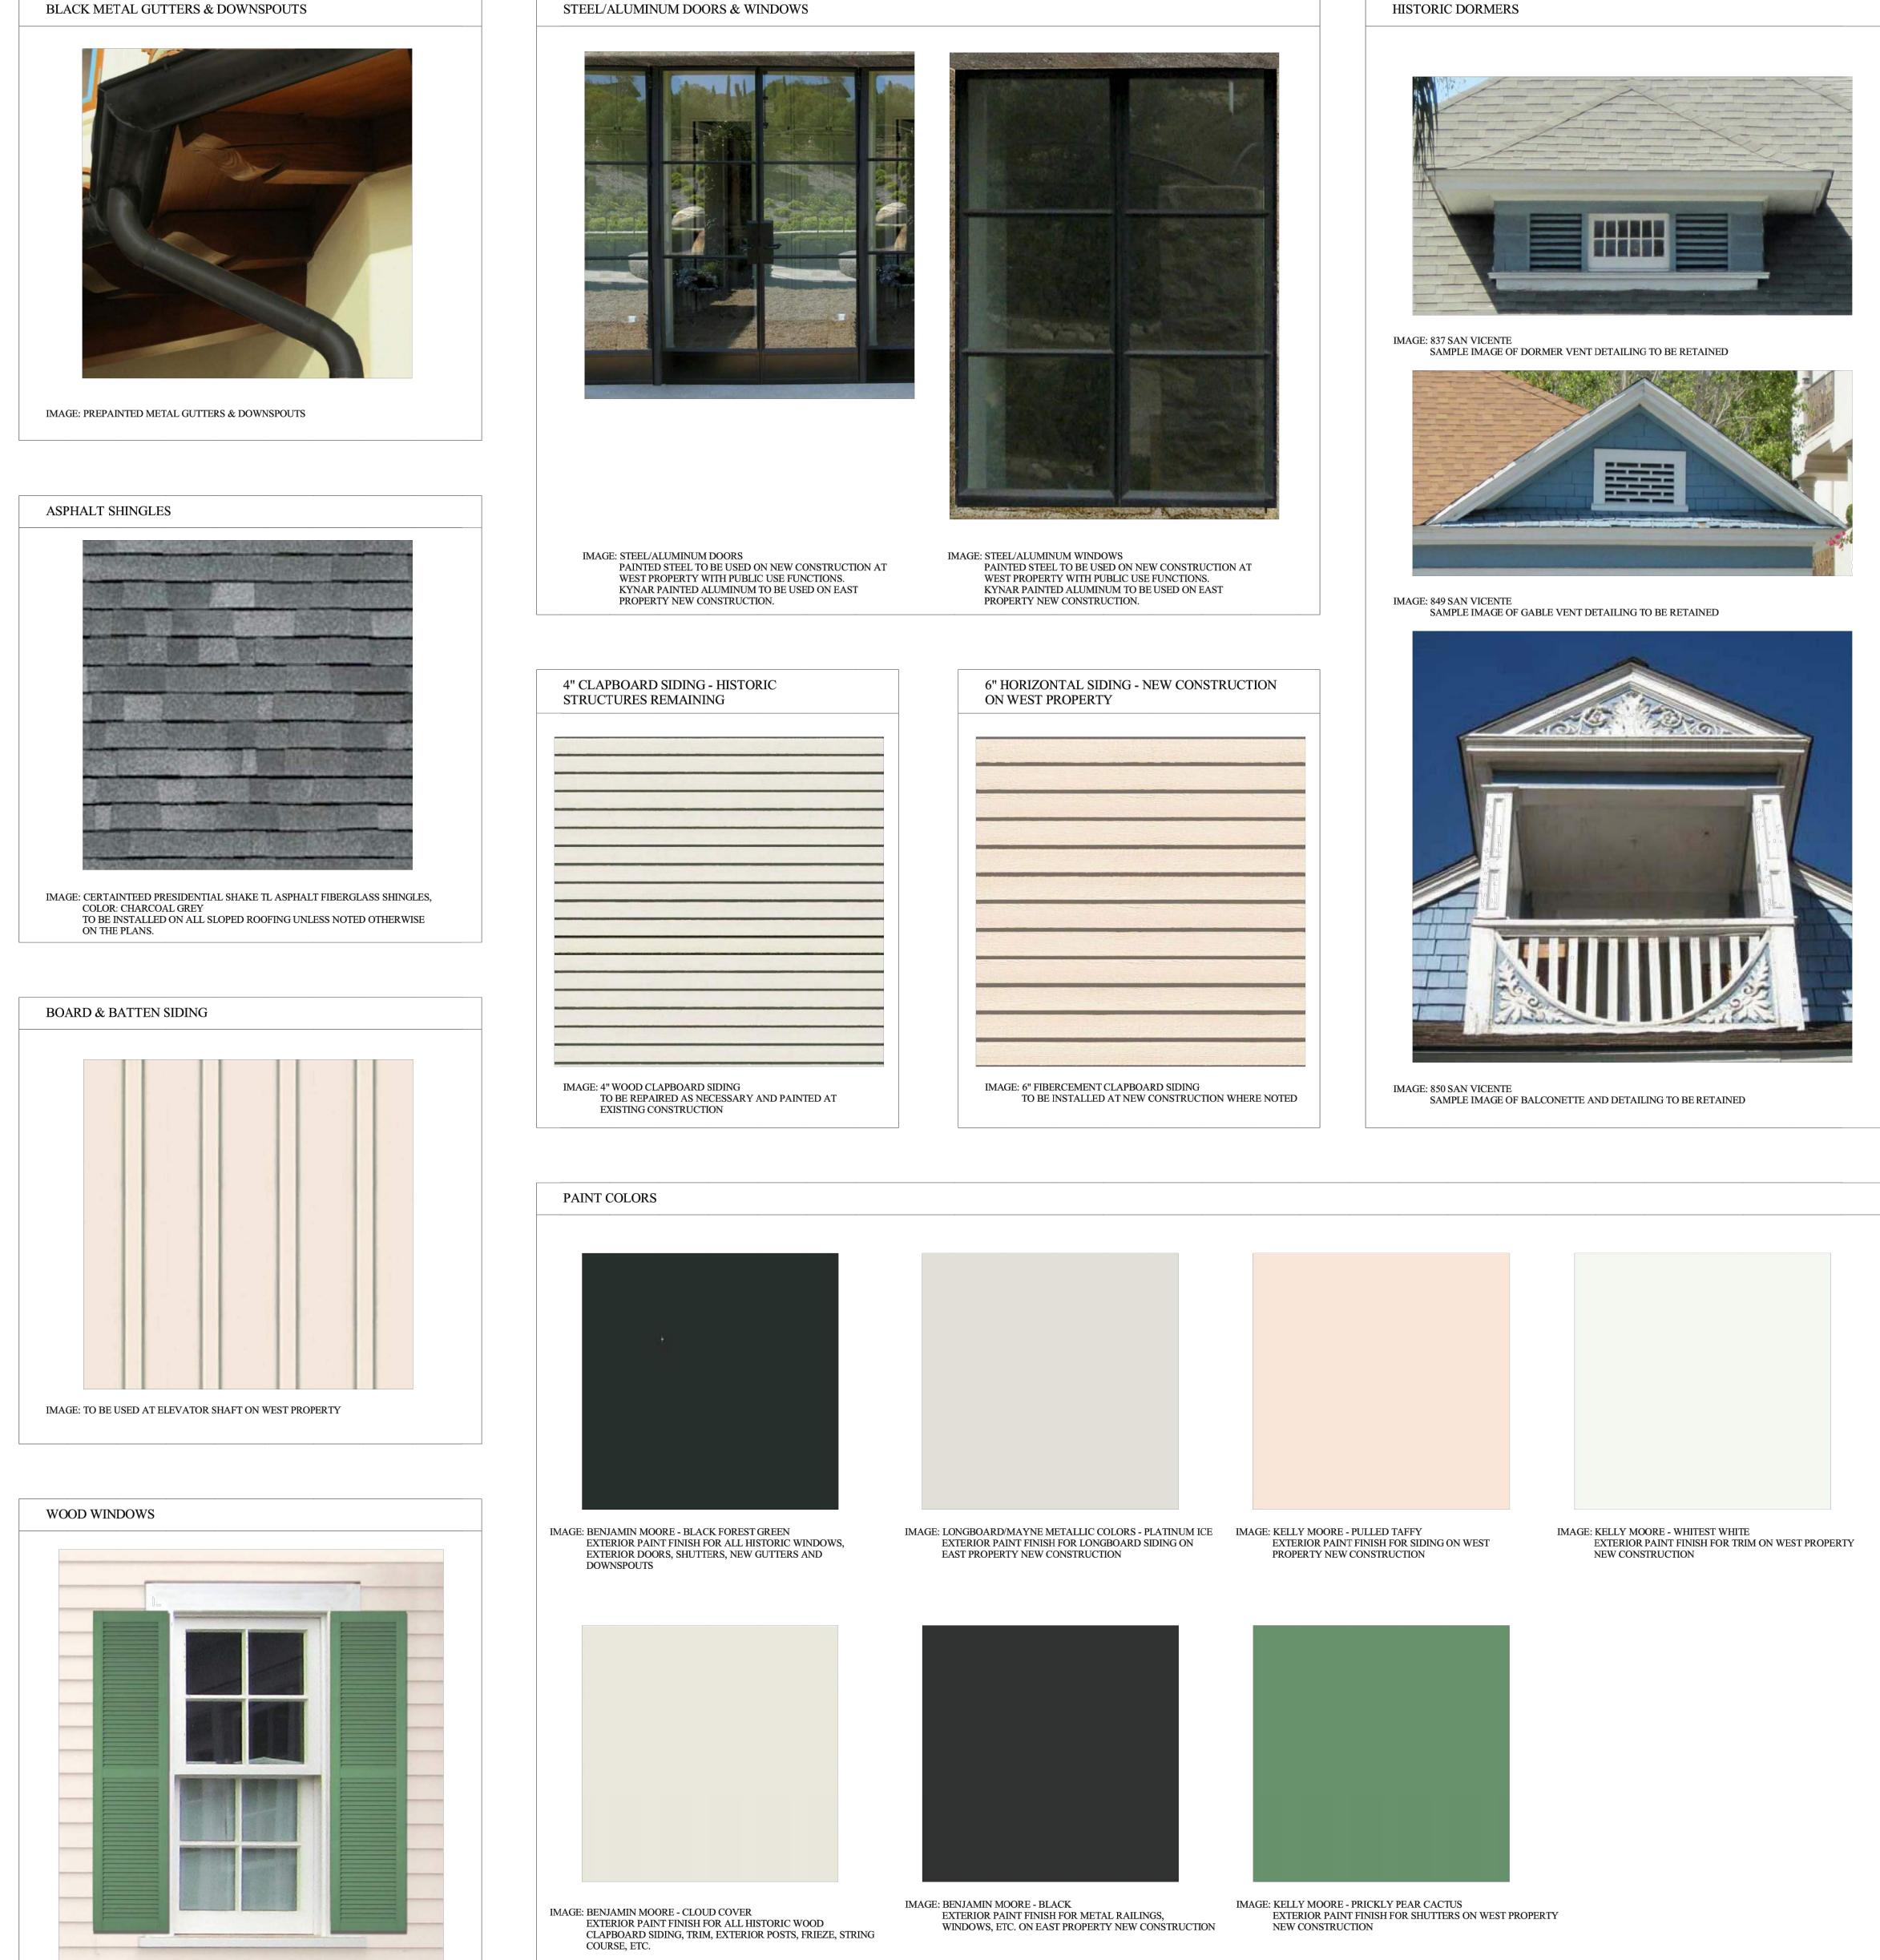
IMAGE: TO BE USED ON ALL NEW CONSTRUCTION WITH PRIVATE USE
